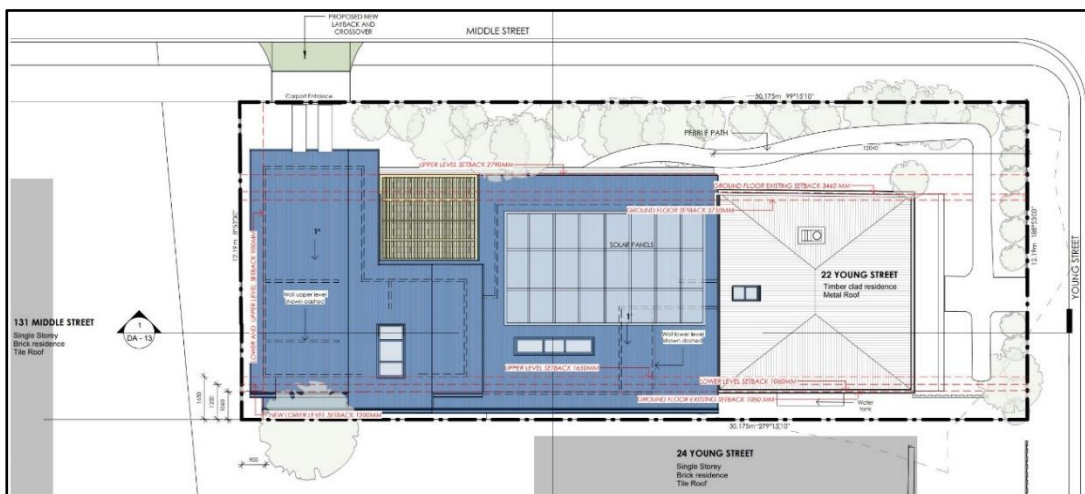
Proposed Roof Plan. (Source: Bentley Design)
